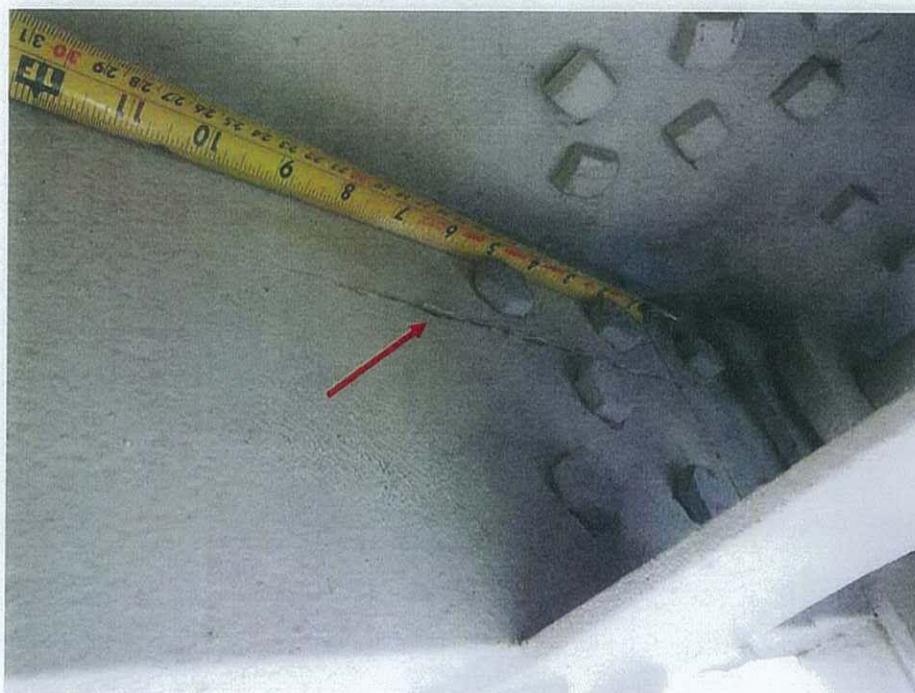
CRACK IN UPPER CHORD OUTER WEB NEAR U2, DOWNSTREAM
